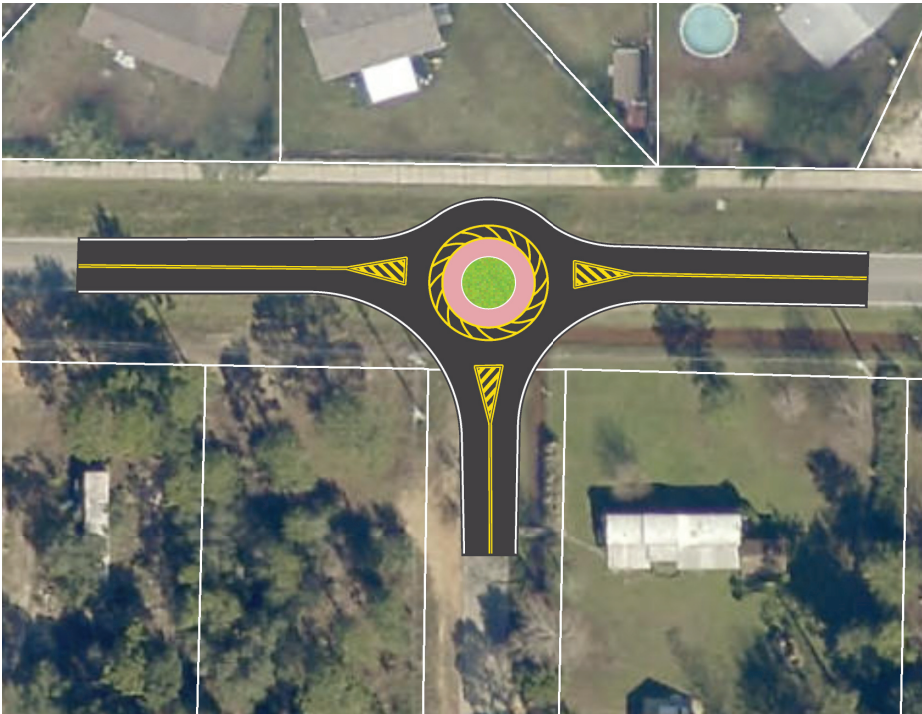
Proposed Roundabout Concept at Andorra Street and East Bay Boulevard
